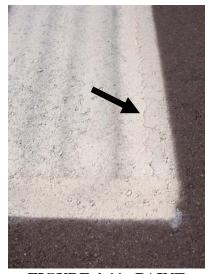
PAINT CRACKS WHEN APPLIED TOO THICKLY.
